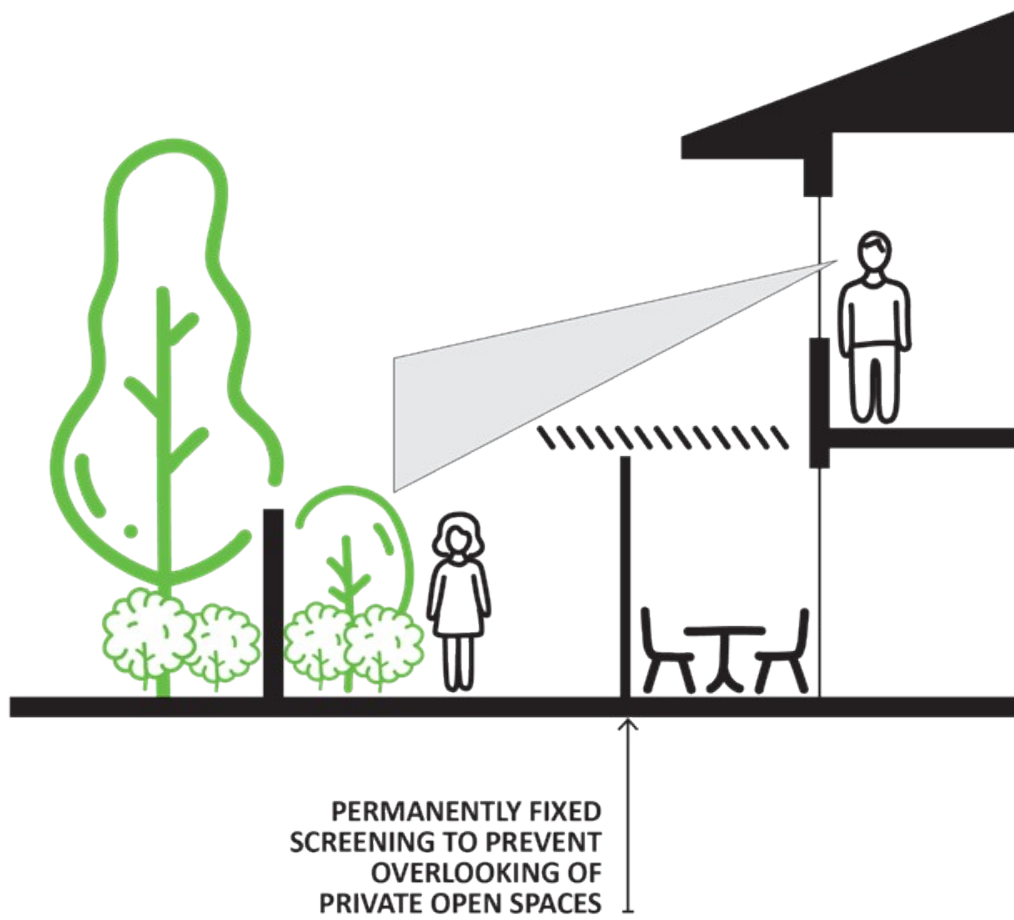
Glazing and fixtures designed to minimise overlooking
